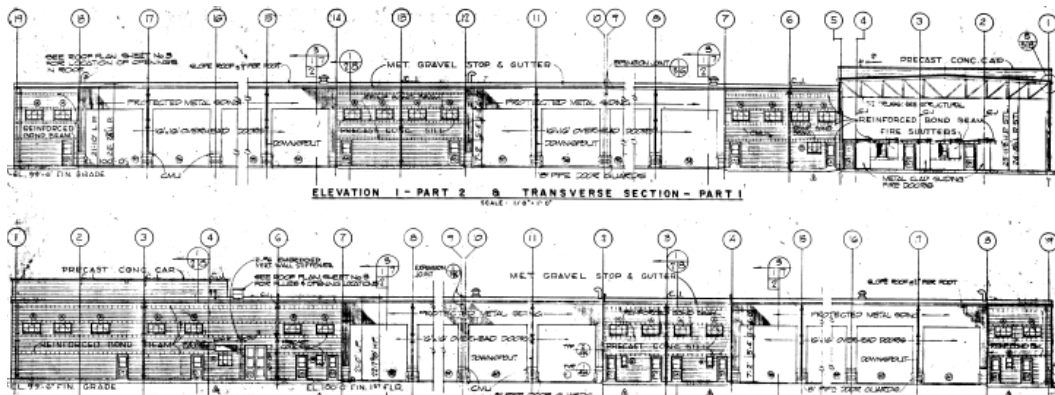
Tactical Equipment Maintenance Facility elevations, Bldg 3492, Fort Carson, CO.
